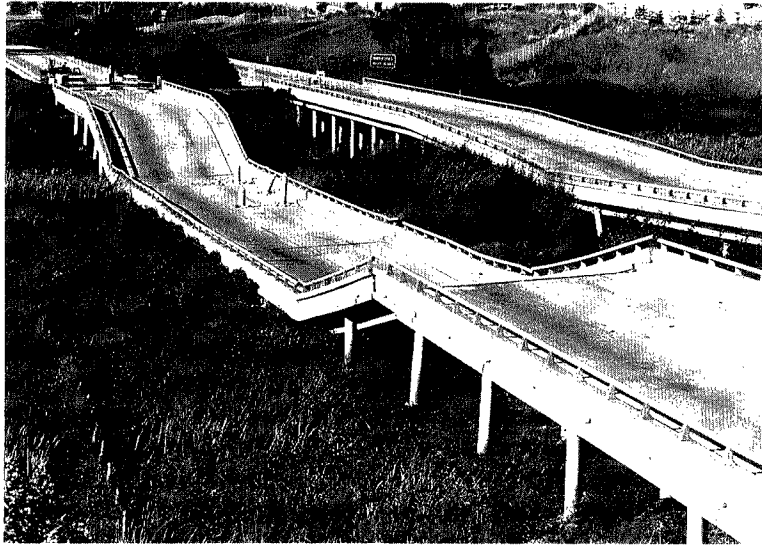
Collapsed Struve Slough Bridge of Hwy. 1 near Watsonville (photographed on 11/5/89).
